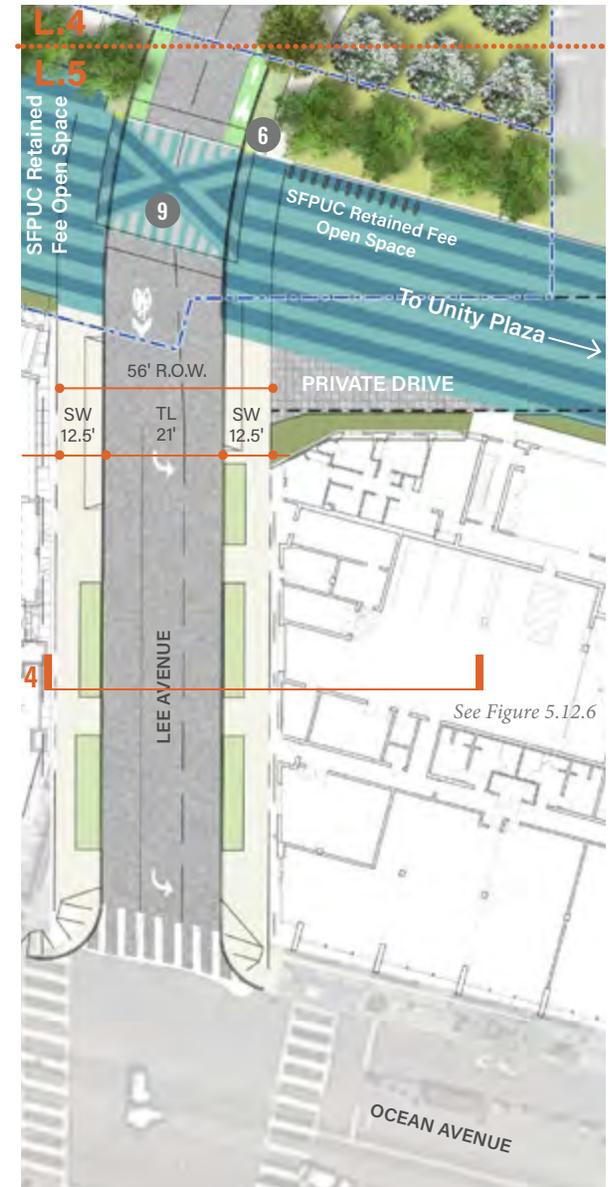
Lee Avenue, Plan Enlargements L.1-L.5
